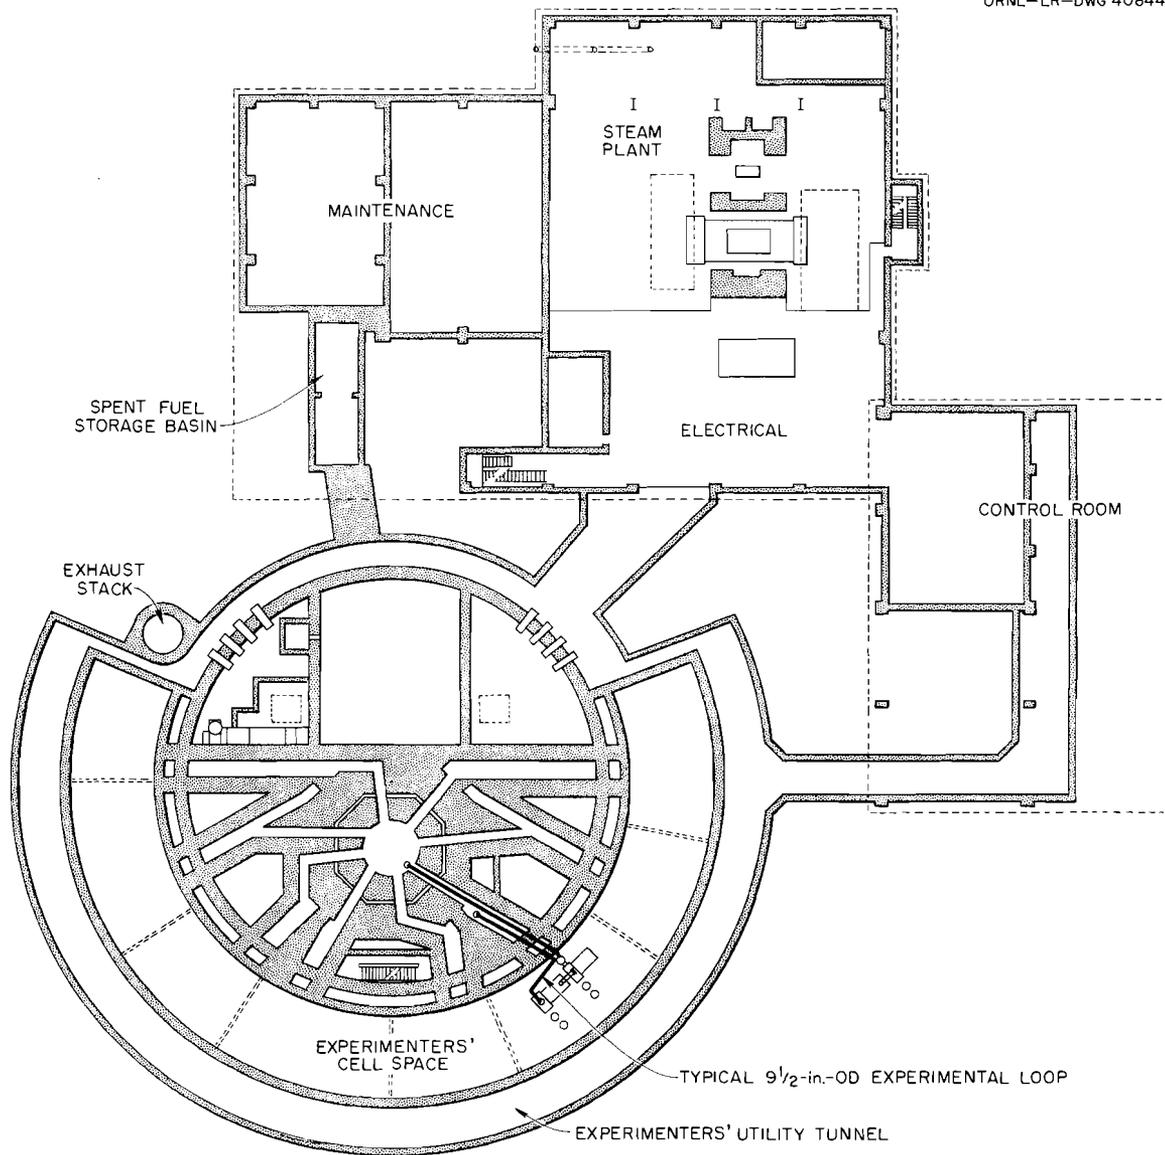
EGCR - Floor Plan of Basement at Elevation 841 ft.
